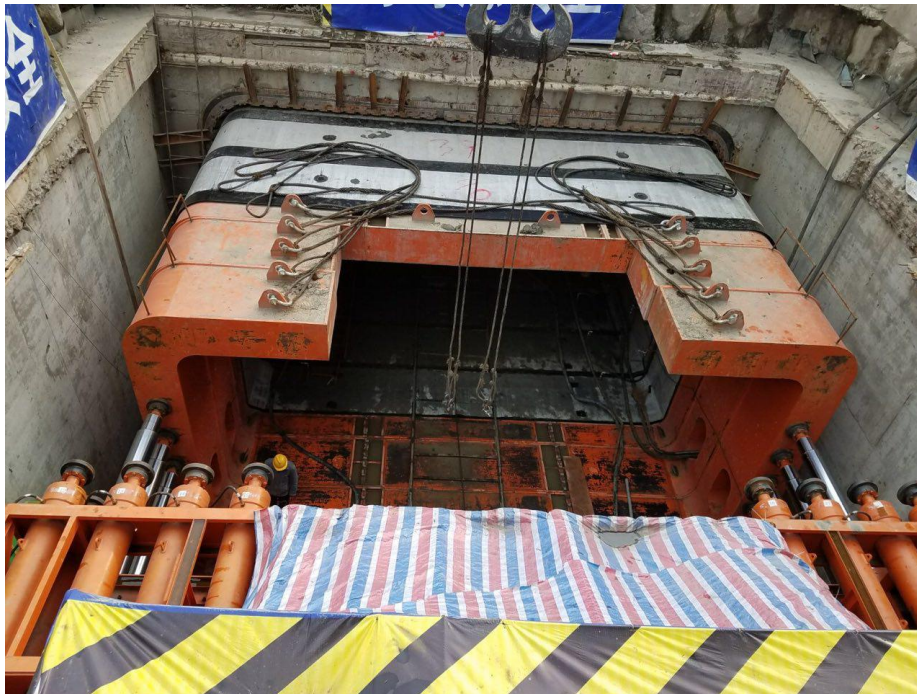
Box Installation in a Tunnel Project in China (Curtesy of Dr. Najafi, 2017)
